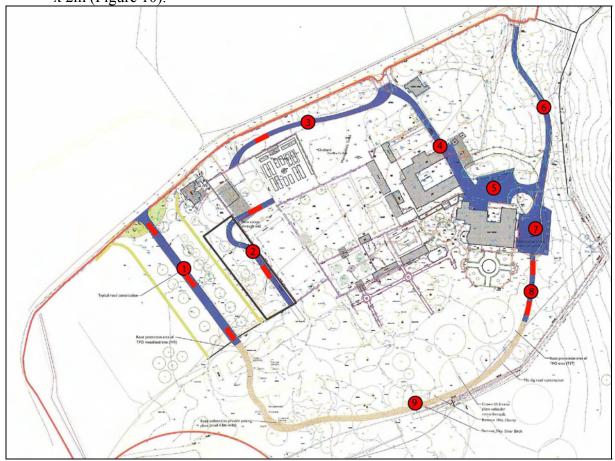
Plan of site, showing proposed access roads, and indicative layout of evaluation trenches in red
